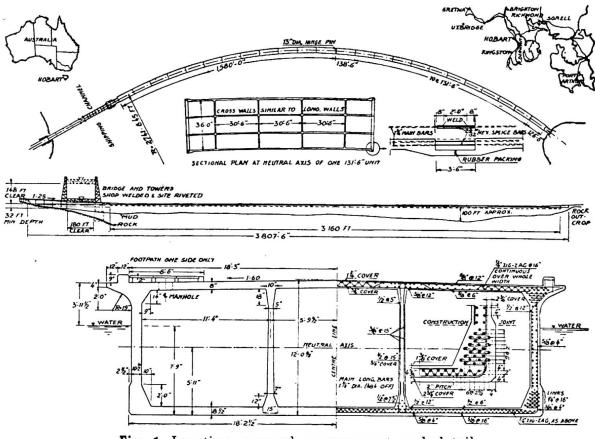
Location, general arrangement and details of the brigde over the river Derwent.
